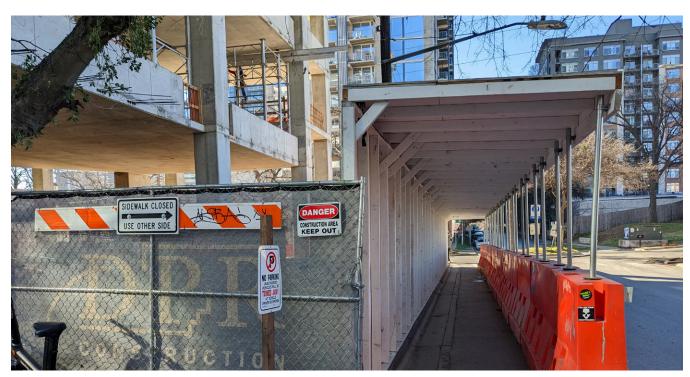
EXAMPLE OF COVERED WALKWAY AT CONSTRUCTION SITE
